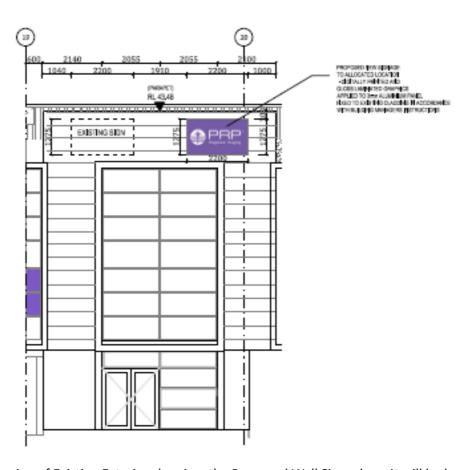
Drawing of Existing Exterior showing the Proposed Wall Sign where it will be located.
